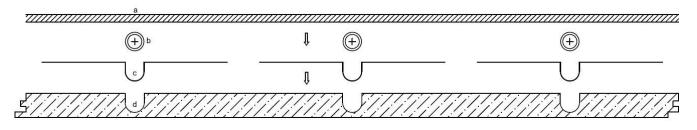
a) Floor covering b) Pipe, 17x2.0 mm c) Heat distribution plate, 0.3 mm, d) Under-floor plate, 22 mm
